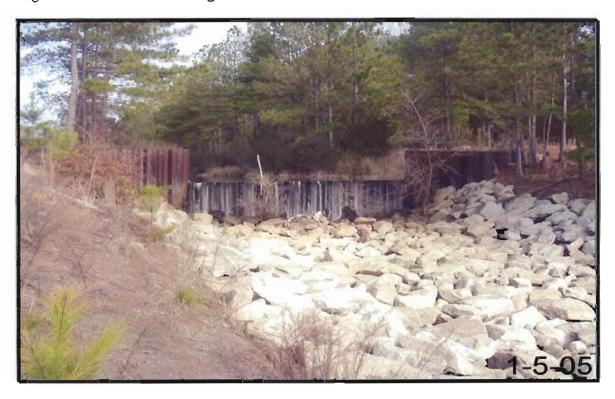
View of Proposed New Location for Outfall F-08 at Downstream Sheet Pile Dam.
